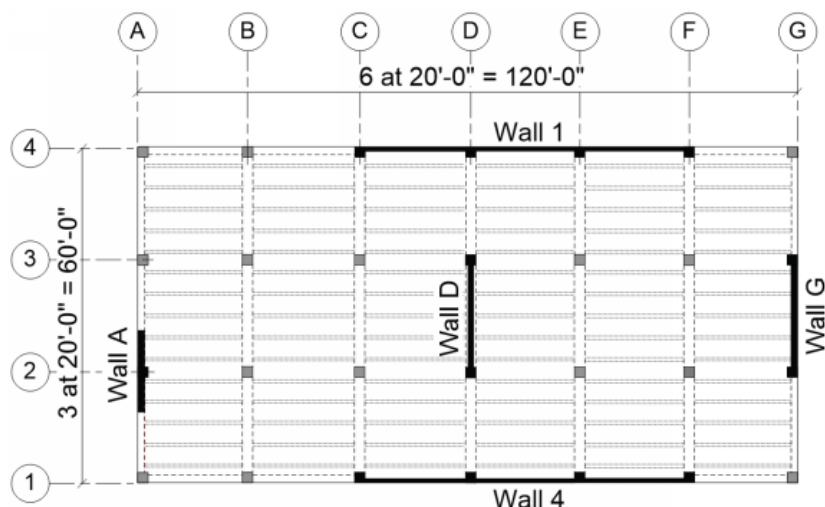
FEMA P-2006 concrete shear wall design example typical floor.
